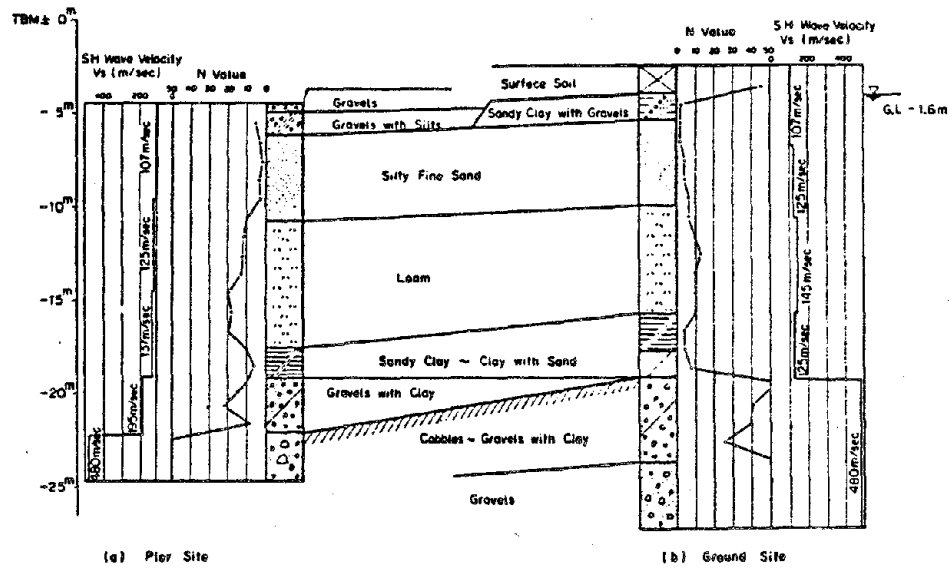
Soil Profile at the Pier Site and Ground Observatory Site
